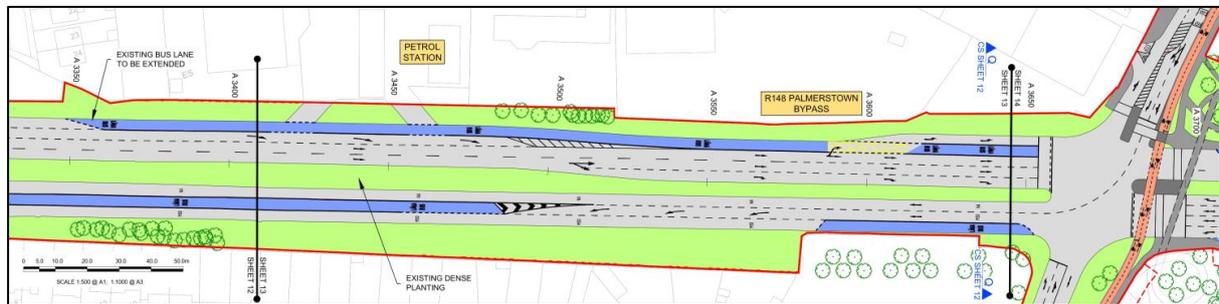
Palmerstown bypass, West of Kennelsfort Road Junction
